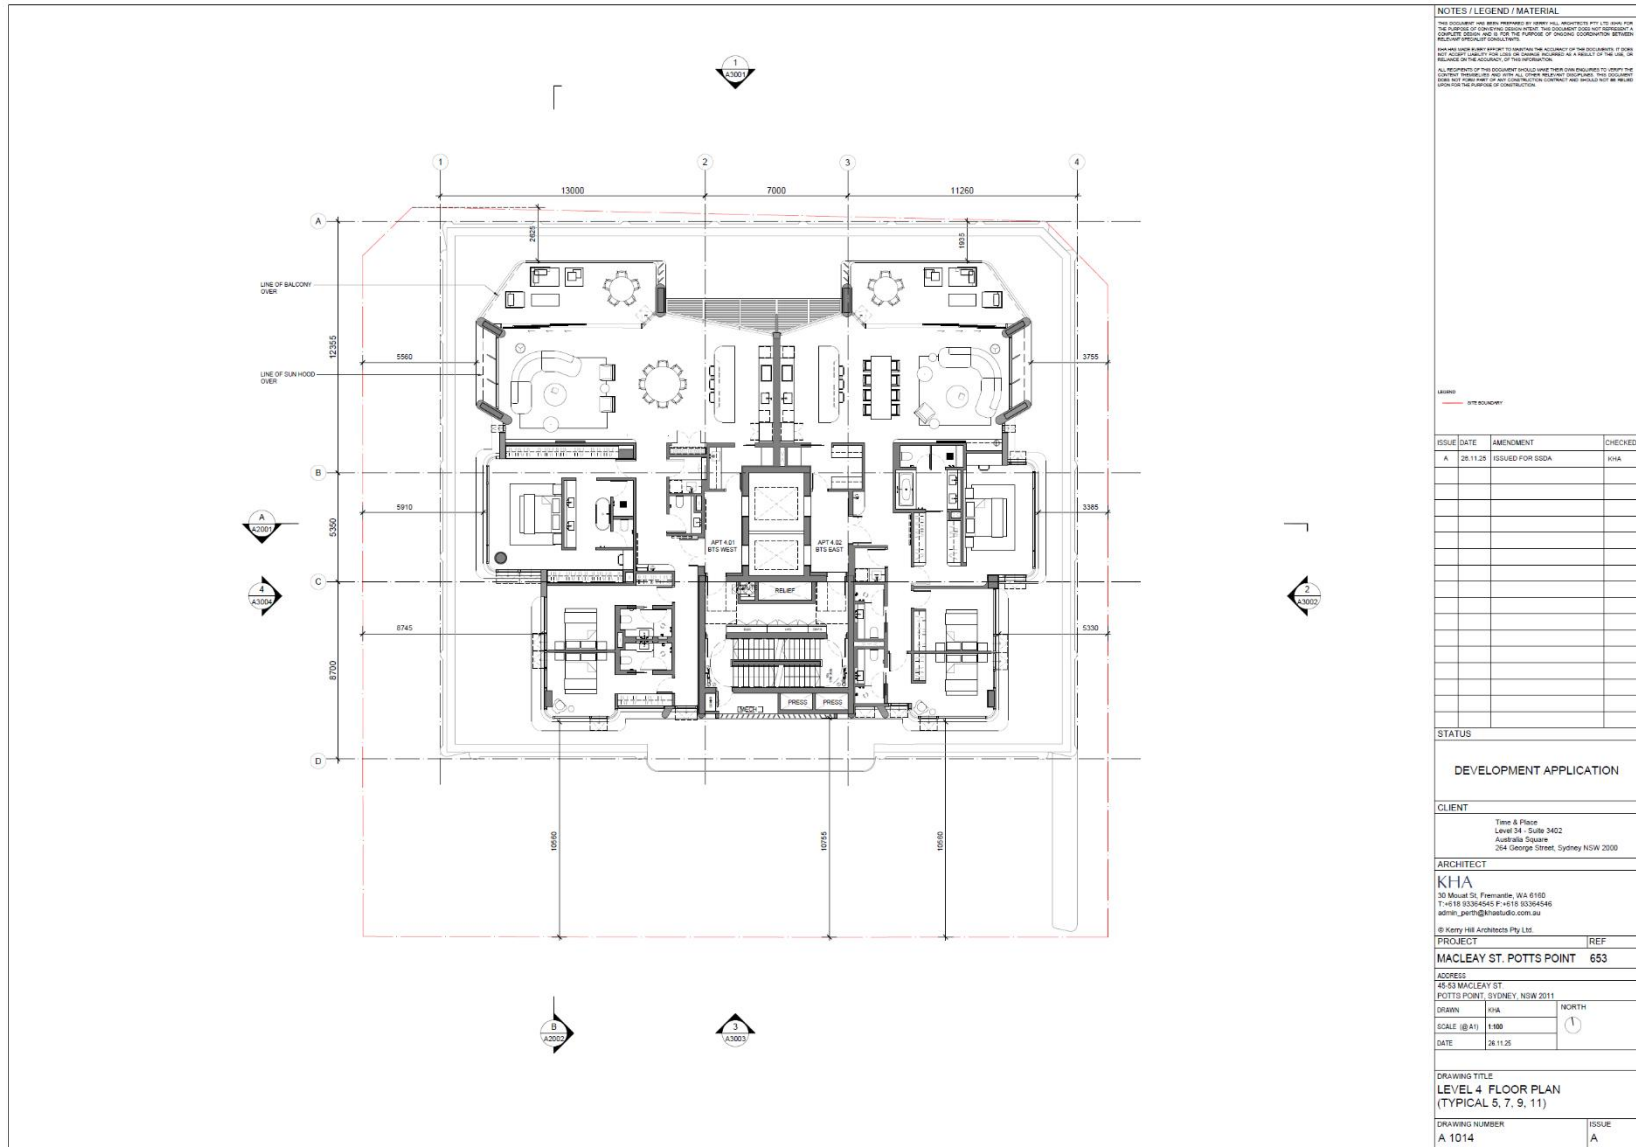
Level 4 floor plan (Kerry Hill Architects)
